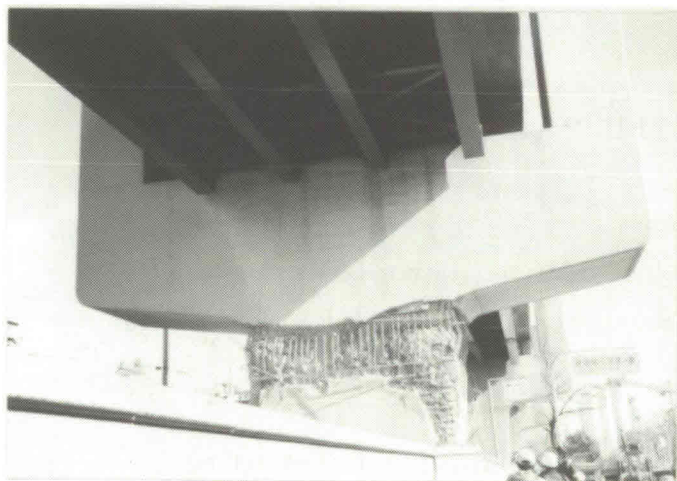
Bending fracture of racket-type double-deck rigid-frame RC bridge (Harbor Highway, Komachihama in Kobe)
